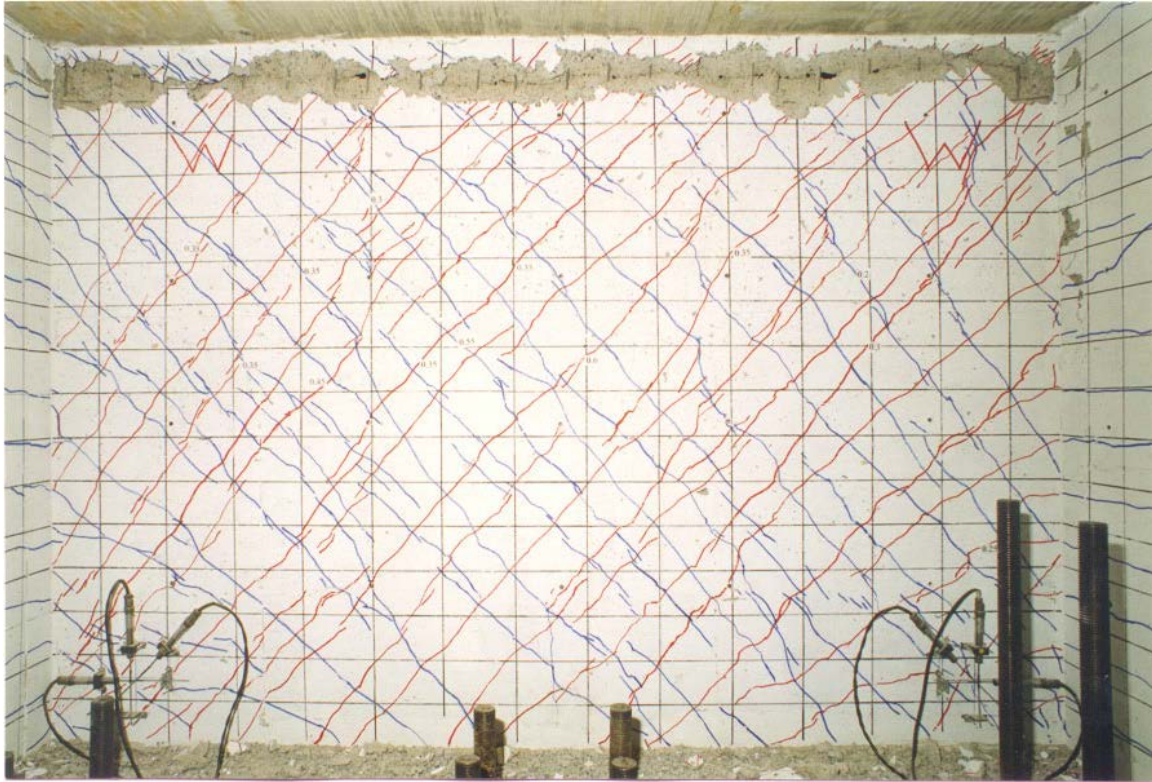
Crack pattern and damage sustained by the web of Palermo shear wall DP2 at the termination of the test (Palermo, 2002)
